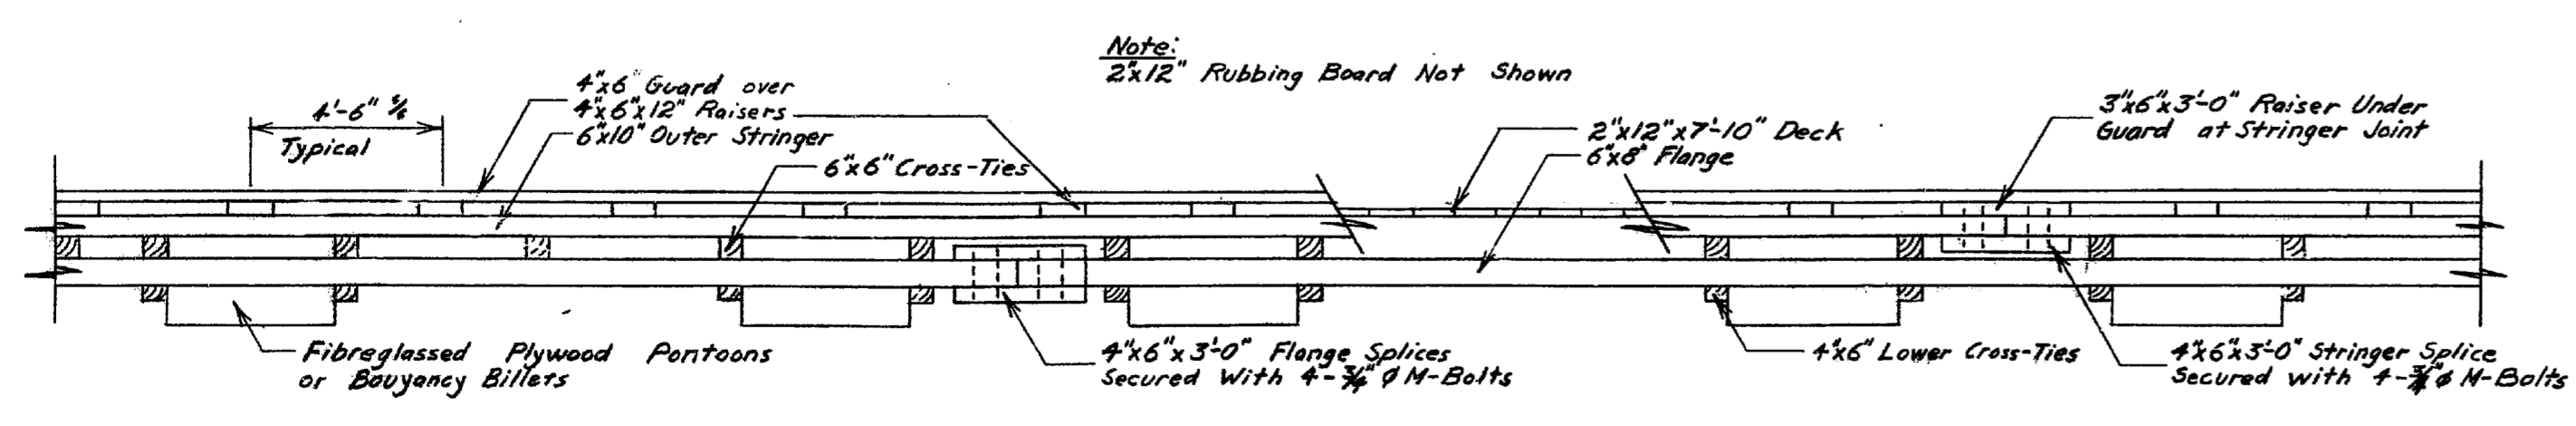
TYPICAL PARTIAL FLOAT ELEVATION Scale: 1/4"=1'-0"
